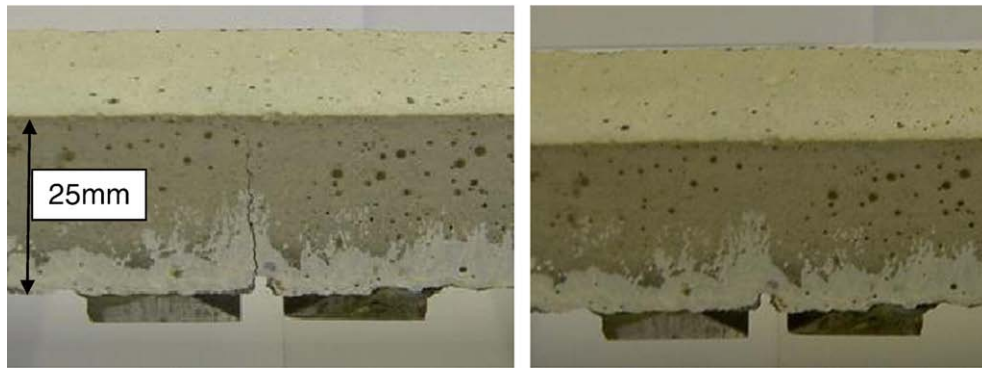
Specimen from Group PET (left) cracked after Stage 1 loading (right) with crack closed after polymer activation (Stage 3).
